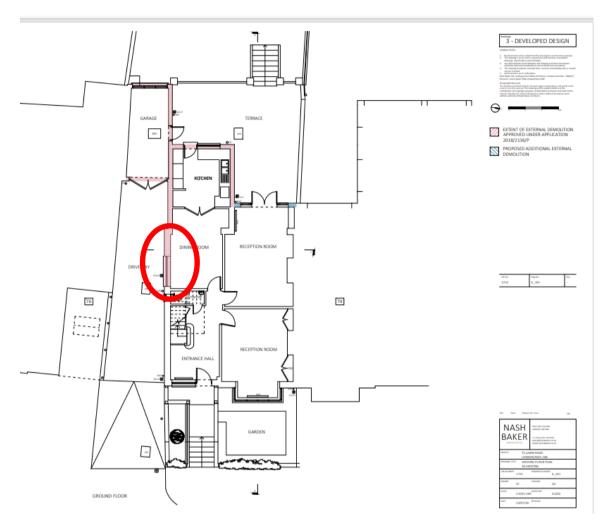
Drawing included in current App 5 (2020/3726/P) – Ground floor demolition in red. Document reference: 1722_6_100 – Plans Sections and Elevations as Existing
